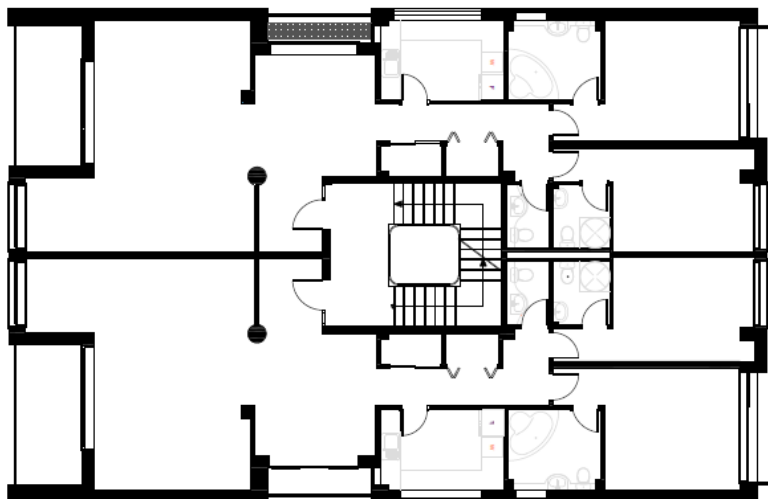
Arh. Mihai Mutiu - Urban Villa, 2007, current floor plan
